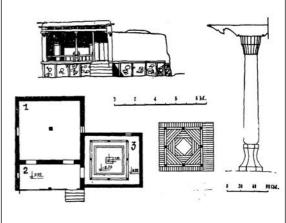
A. Mosque with school in the village Esiz in Old Matcha. Façade, plan of dars honeh plafond; ayvan column: 1 – winter room; 2 – ayvan; 3 – dars honeh room.
